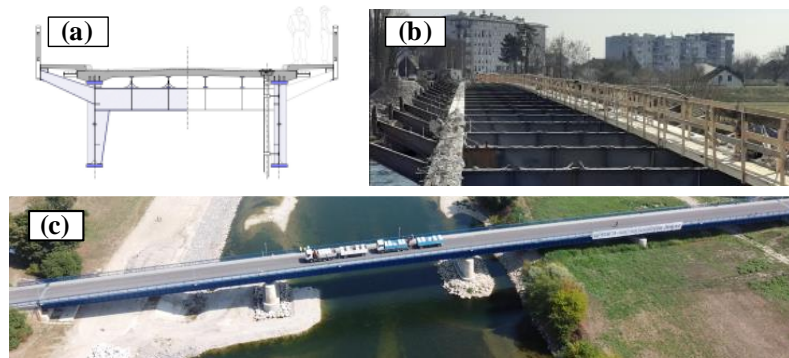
Bridge reconstruction phases. (a) bridge cross-section designed in 2019., (b) bridge superstructure without bridge deck, (c) bridge after reconstruction
